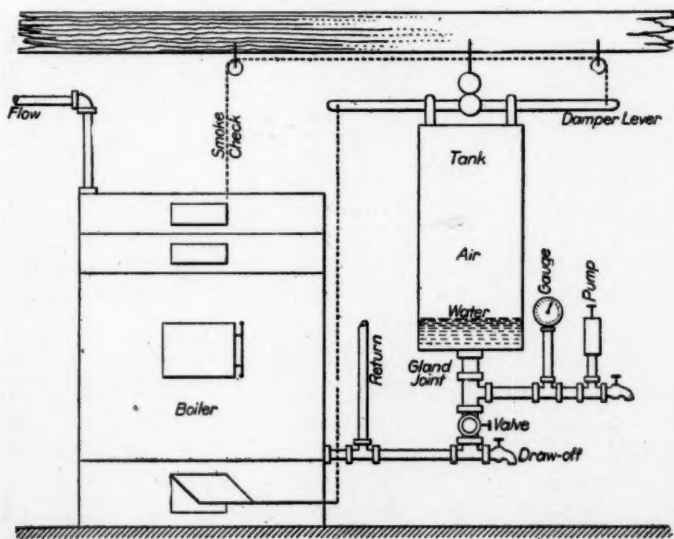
COMBINED EXPANSION TANK AND DRAFT CONTROL.
